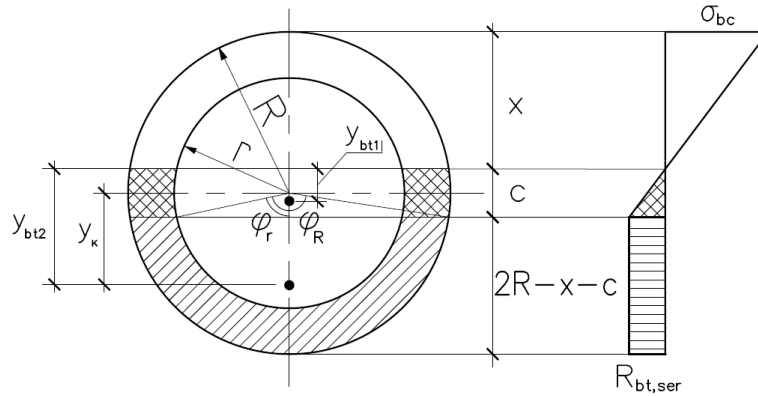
A diagram for determining the longitudinal force and bending moment of a stretched concrete zone
